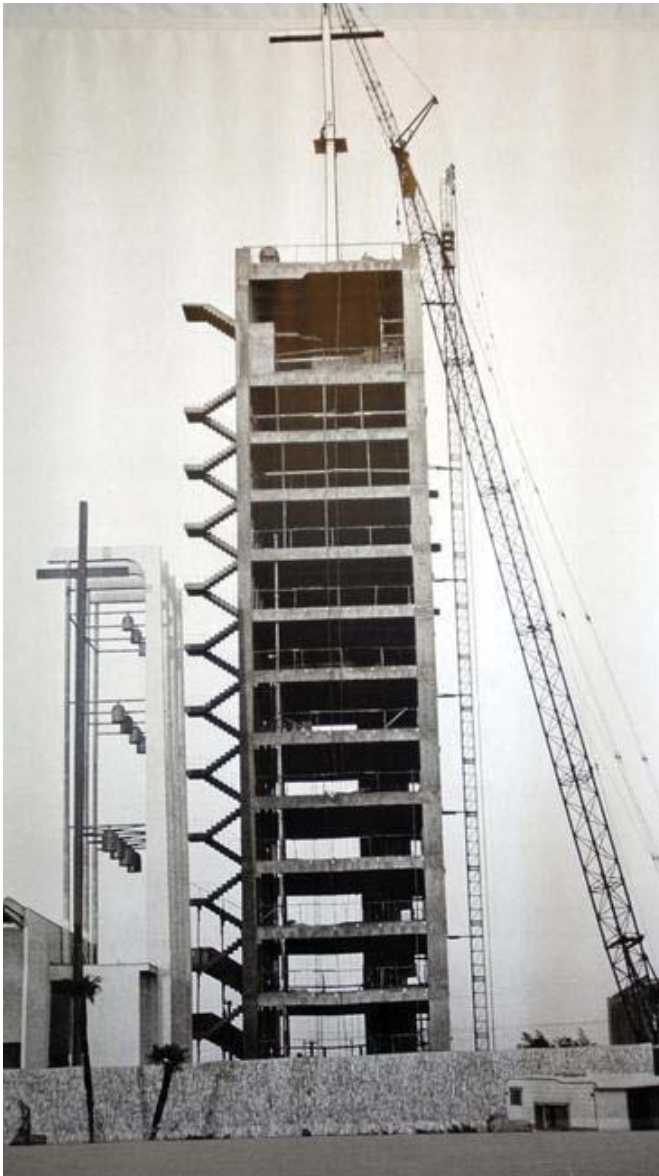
Erection of the steel cross on the roof of the Tower of Hope in 1968. (Richard and Dion Neutra Paper Archives, 1925-1970).
